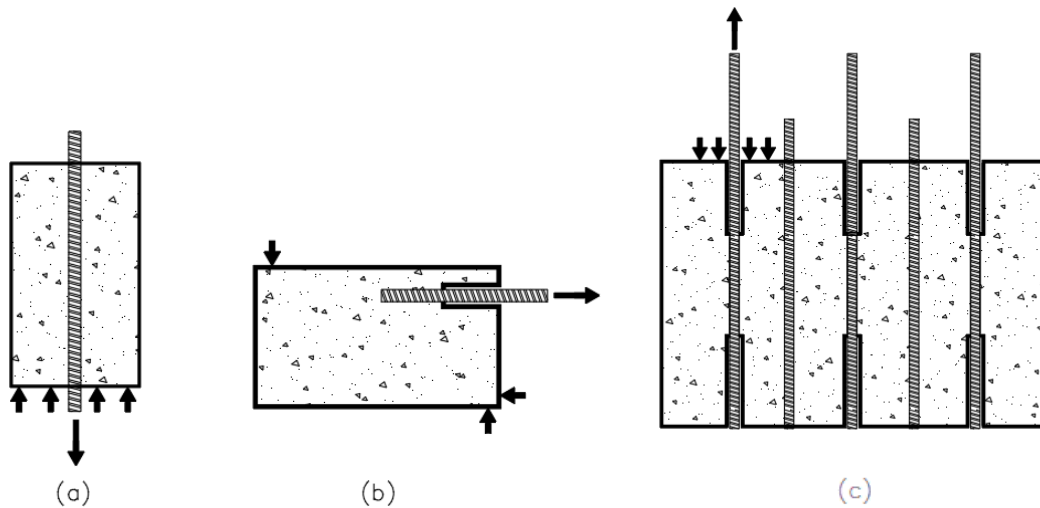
Pullout testing methods (a) pullout specimen and (b) beam end specimen and (c) the pullout testing method for tremie-placed specimens used in this study.
